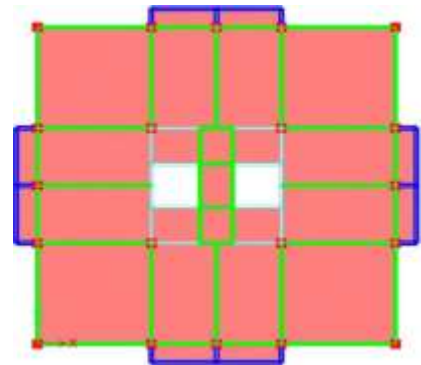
Floor plan of all steel beam-concrete column hybrid structure
